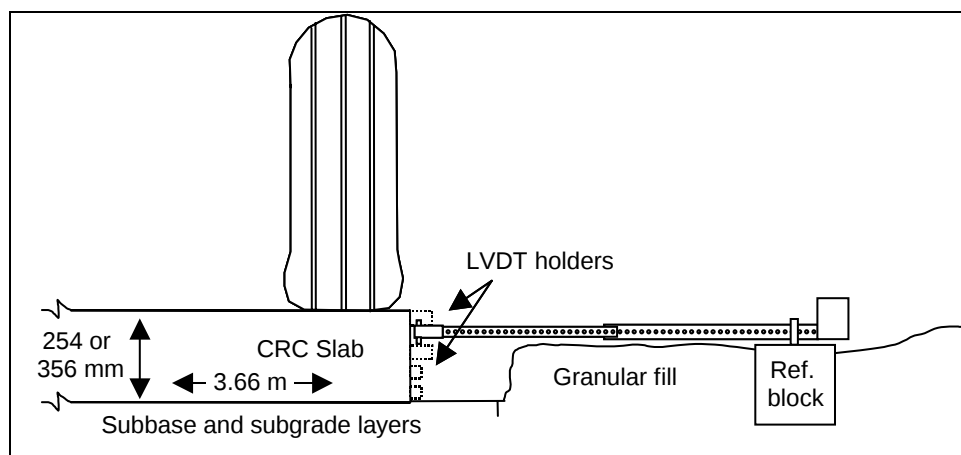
Cross-sectional view of loading and instrumentation at pavement edge
